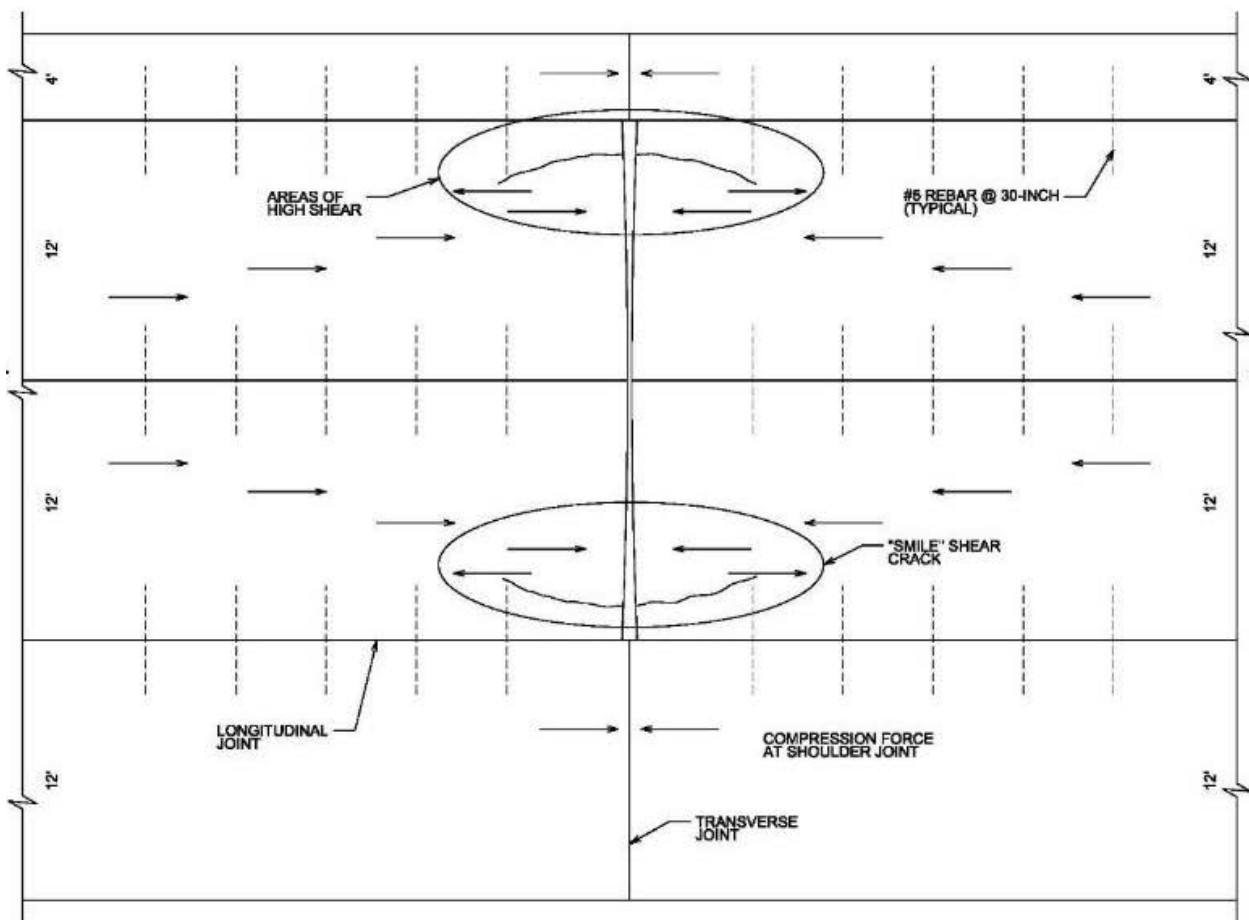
Illustration. Longitudinal cracking in a pavement lane with activated joints when joint movement is restrained by tying on a new adjacent lane (Harrington et al. 2018). Figure depicts existing 12-foot lanes (middle of figure) with the addition of new 12-foot outside shoulder (bottom of figure) and new 4-foot inside shoulder (top of figure).
